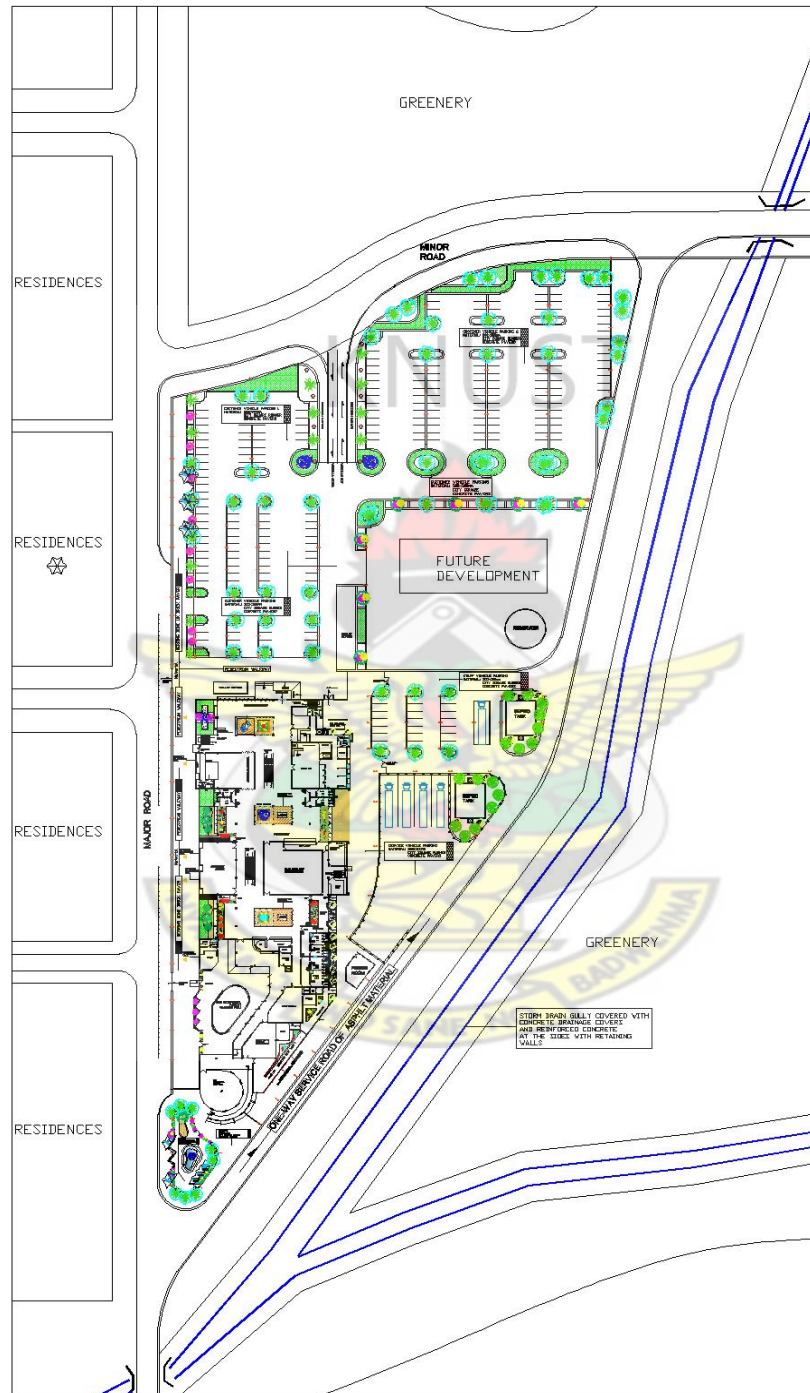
Conceptual sketch plan of option 3: Sketch of site layout of proposed Tema commercial centre
